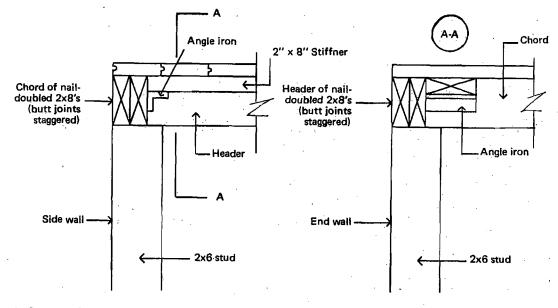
Corner stiffening example. Connection and wall construction details are not shown.
